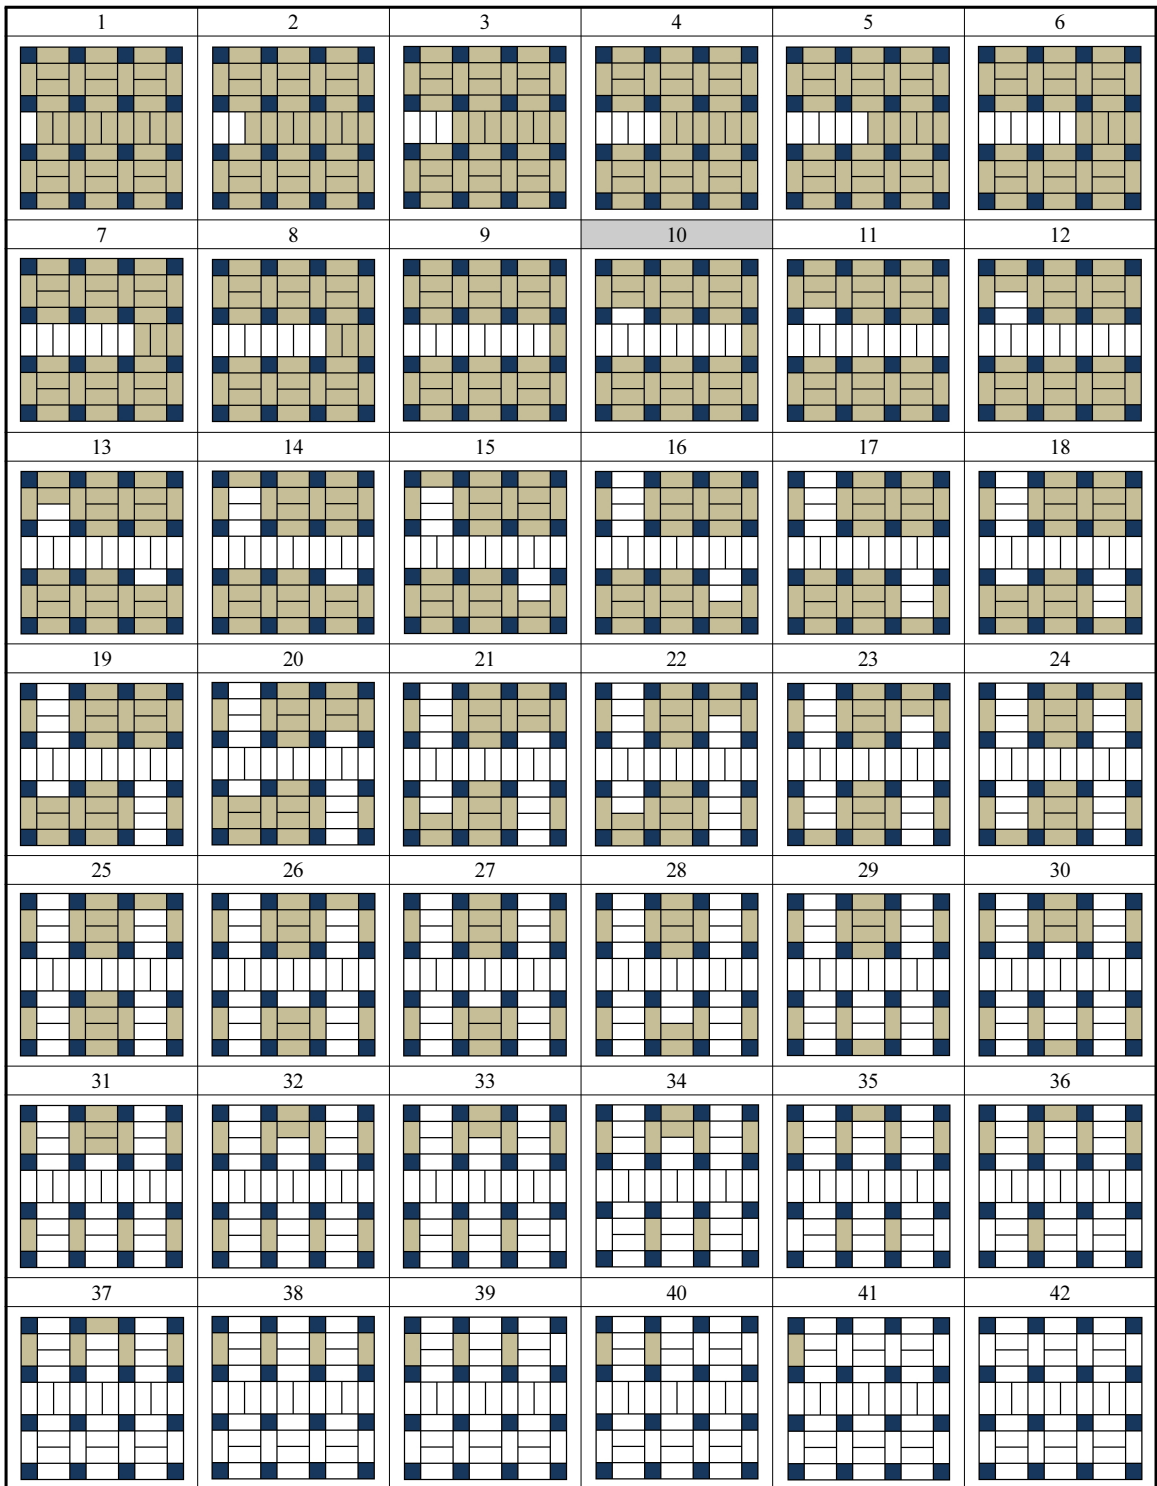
Excavation sequence of an underground room-and-pillar structure (30×30 m)
